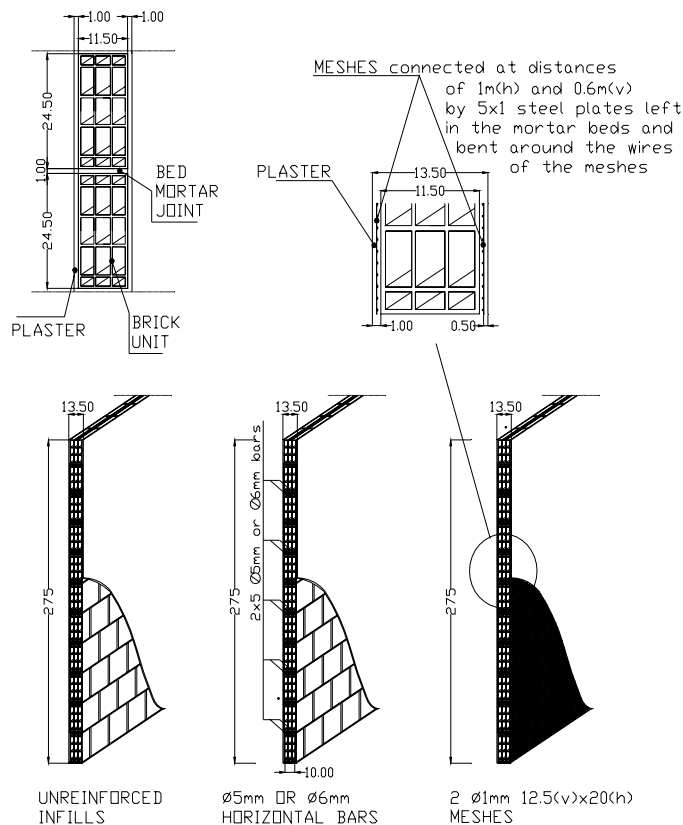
Details of the position of the steel bars and of the meshes to reinforce masonry panels (after [3])
